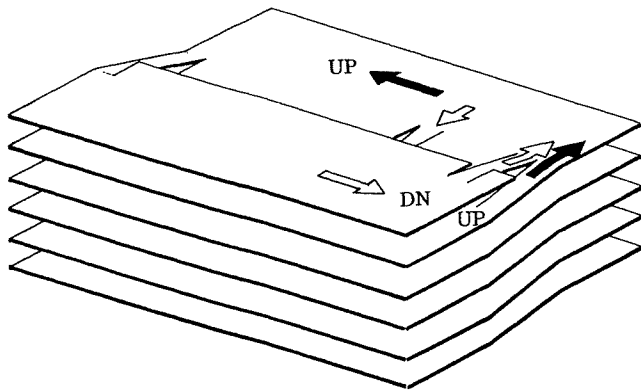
This staggered floor system provides parking on level floors and desirable one-way traffic flow.
